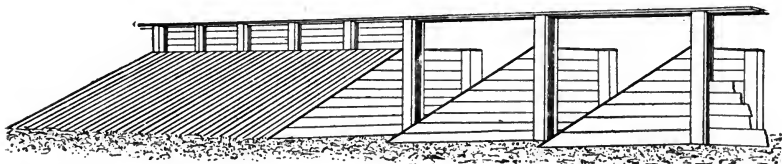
OPEN WEIR. MONTE VISTA CANAL.
